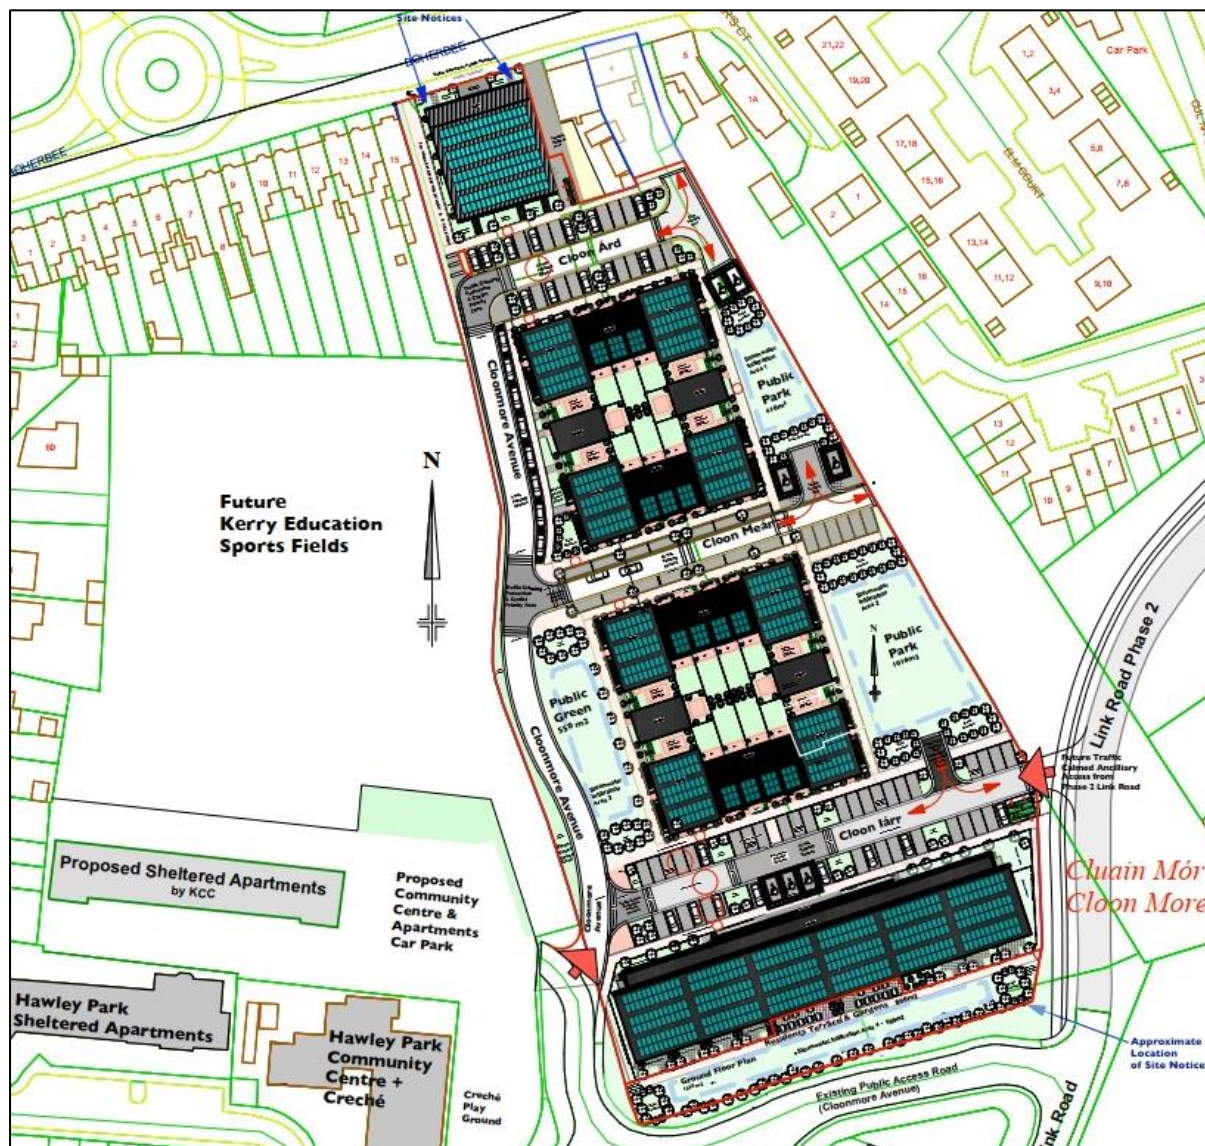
Proposed Cloonmore Regeneration LRD Layout Plan
